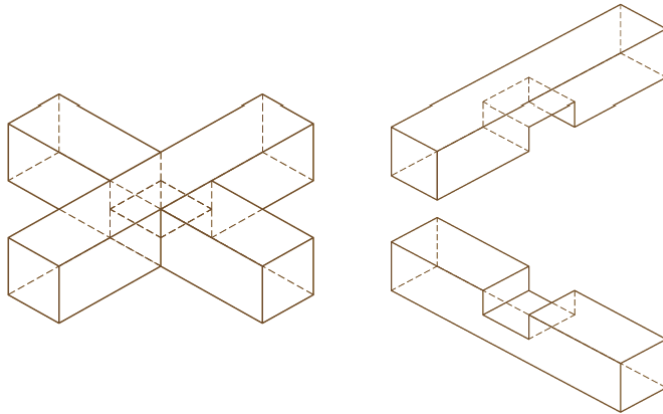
Aigaki joint from Traditional Japanese wood joinery and its modern translations, by F. Horace, 2024.
